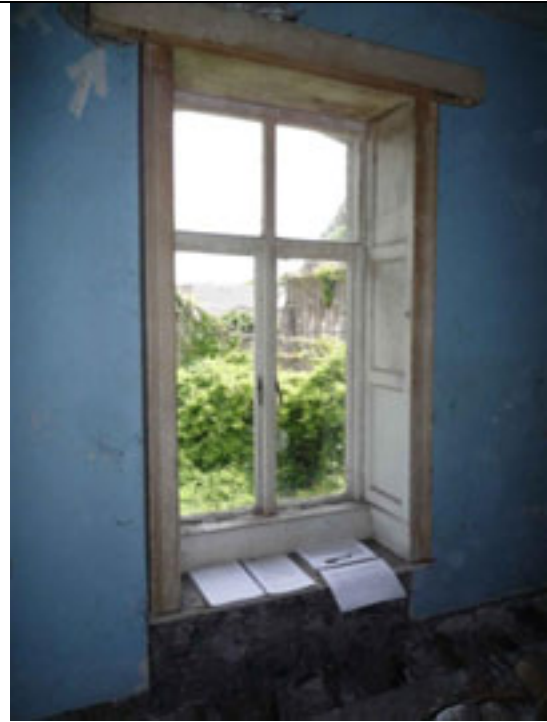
Early timber window joinery. Note the architrave rests on a projecting window apron.
